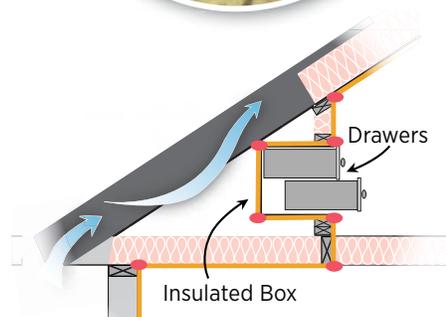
Build an airtight, insulated box around any drawers or closets built into attic knee walls that extend into uninsulated attic space. Insulate along air barrier (shown in yellow on drawing) or along roof line with rigid foam (Source: Iowa Energy Center 2008).
